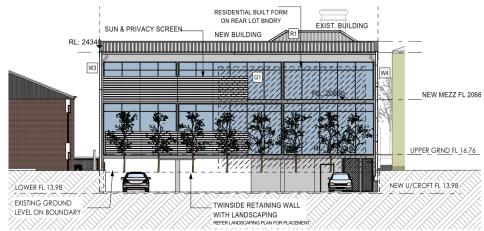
North-east elevation plan of No. 276 Newcastle Street, Perth, showing the previously approved privacy screening.
